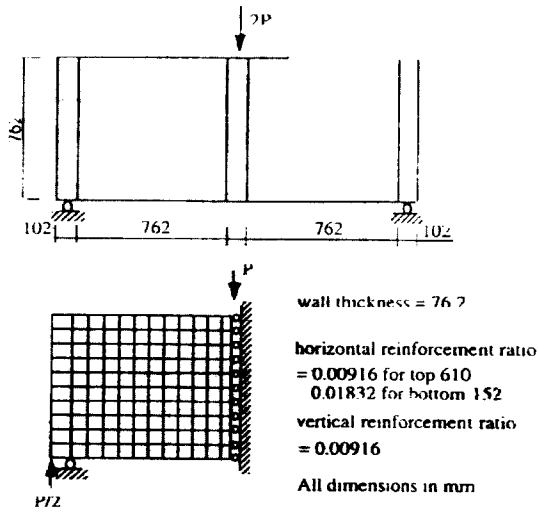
Reinforced concrete panel beam W2 tested by Cervenka(1972)
